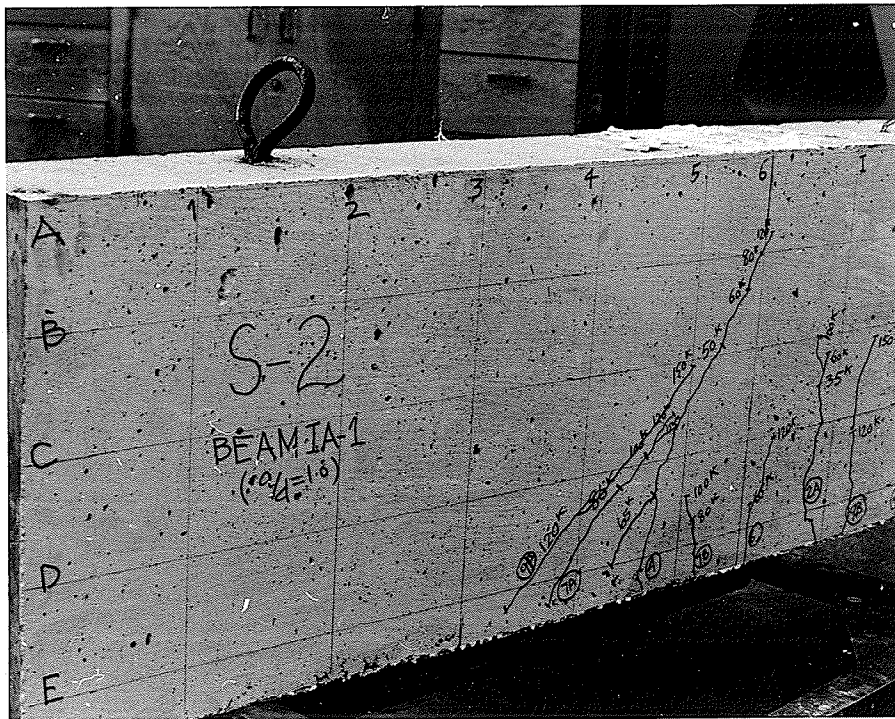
CRACK LOCATIONS ON SIDE S2 OF BEAM IA-1
